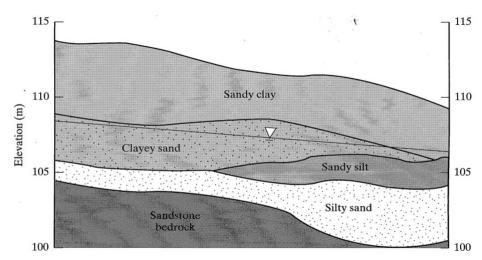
Typical Two-Dimensional Cross-Section Through A Site
